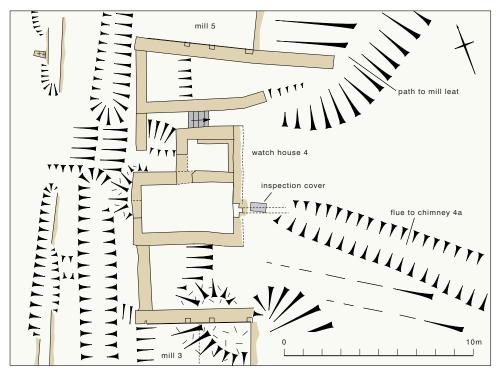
Plan of watch house (building 4) (Drawn by Tony Berry and Philip Sinton. © English Heritage)
